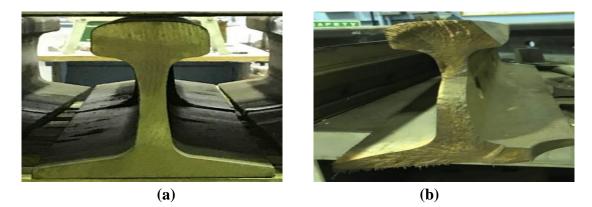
Illustrative Example of (a) an Unworn Rail Section and (b) a Deteriorated Rail Section.
